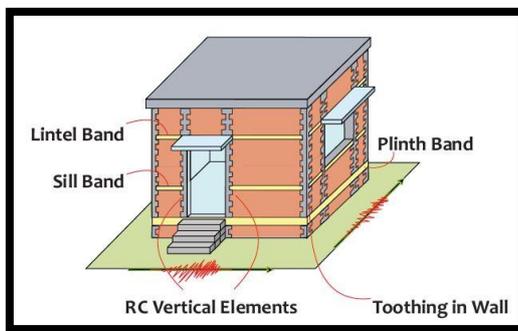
Structural Components of Confined Masonry Building (Ref. Build a Safe House with Confined Masonry⁴)
